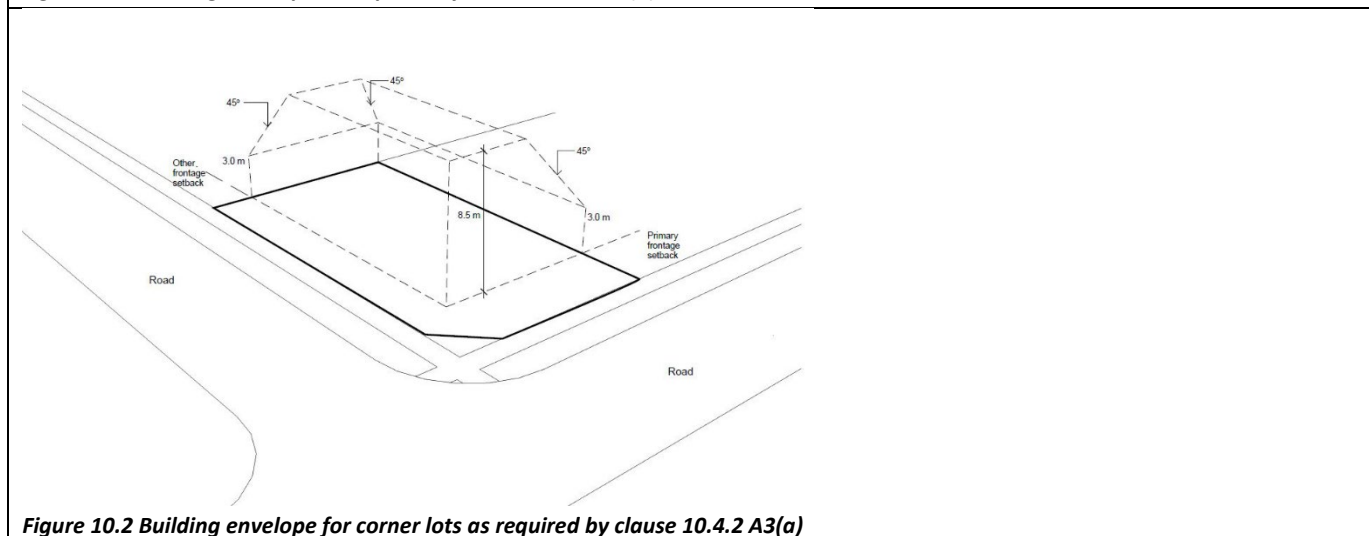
Building envelope for corner lots as required by clause 10.4.2 A3(a)
